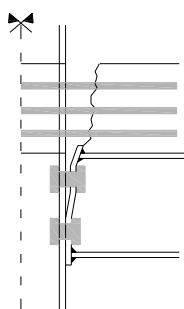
Crack associated to the deformation of the end-plate embedded in the concrete slab
